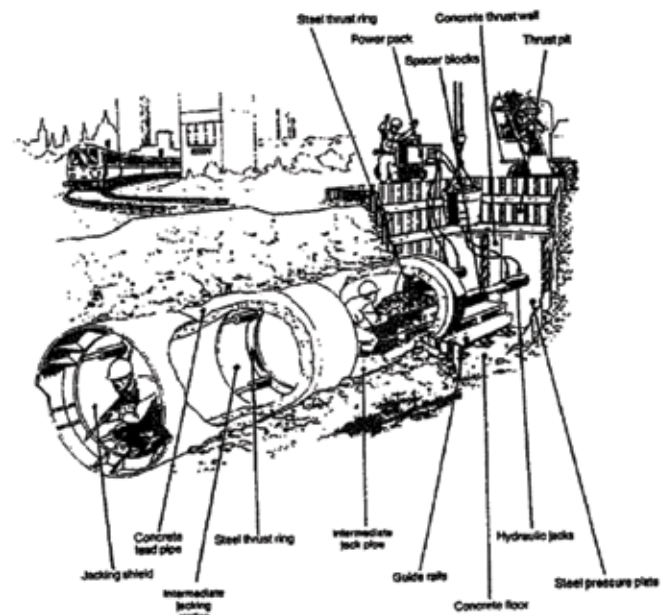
Typical components of a pipe jacking operation with shield. (Courtesy of U.K. Pipe Jacking Association)
